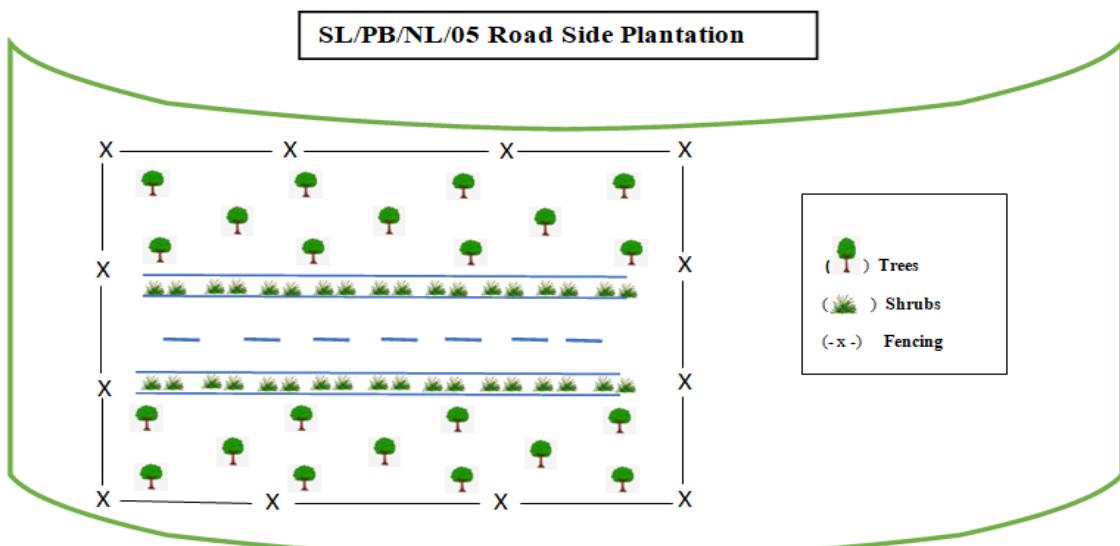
24 Plantation Design of Road Side Plantation Model SL/PB/NL/05
